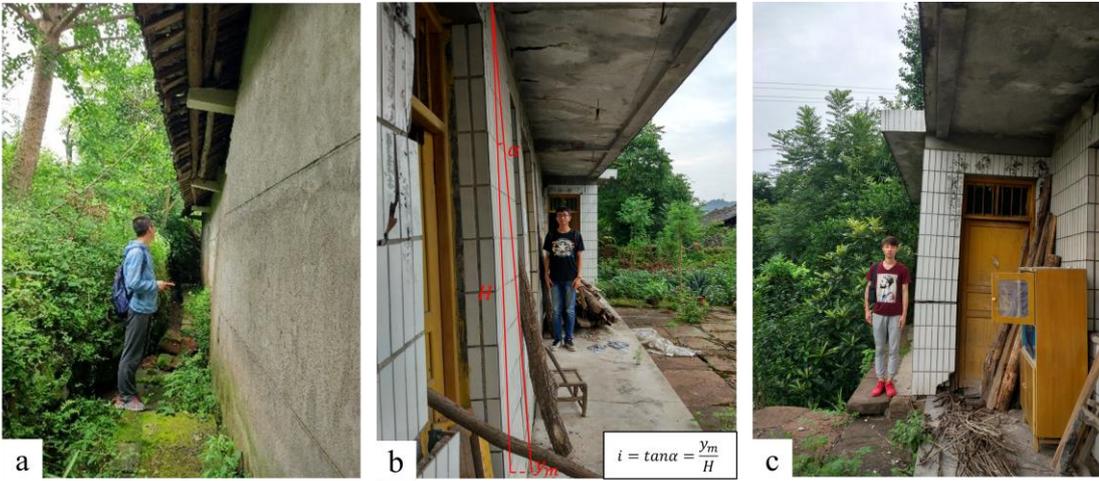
The integral decline state of the case study building:(a) the back wall of the building with inclination of 1.0%,(b) the front wall of the building with inclination of 0.8%,(c) the front wall of room A (shown in fig 9)with inclination of 0.7%
